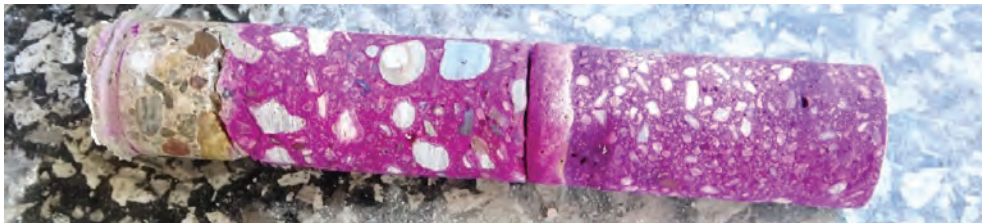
Core C6 with top of topping slab to the right then moving left there is the sanding tile grout then original suspended slab with render and paint on the soffit at the left end of the above sample.
